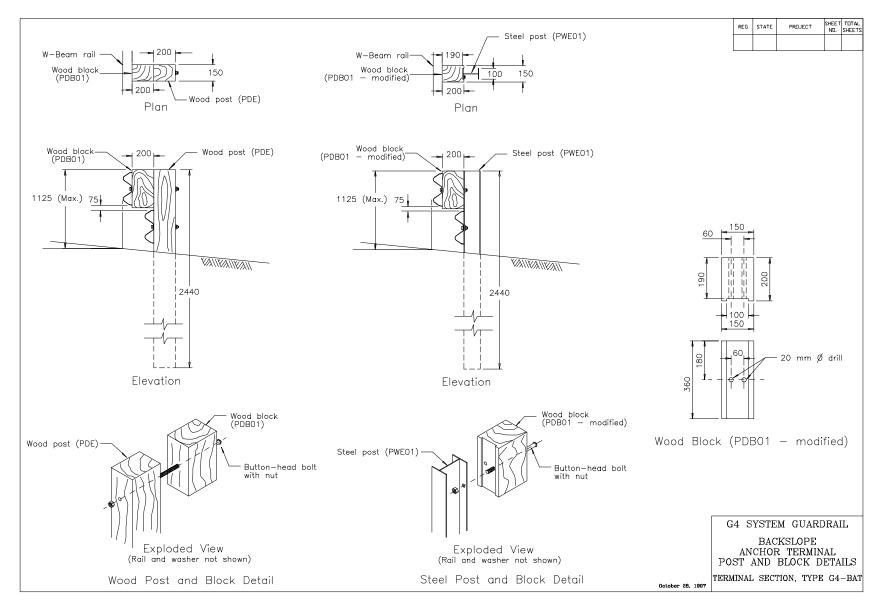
Details of the G4 W-beam guardrail buried-in-backslope terminal installation for test 404211-1 (continued).
